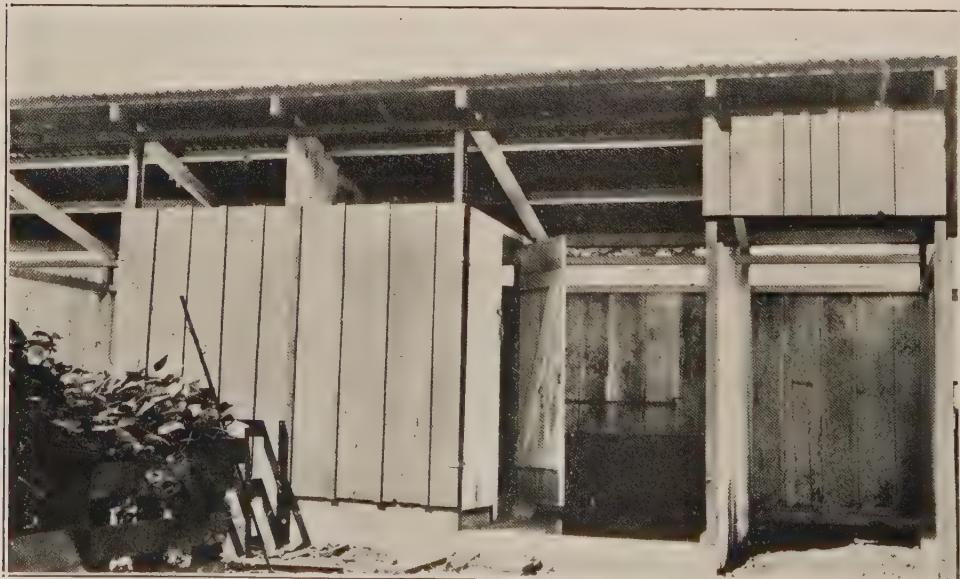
New sanitary outbuilding, floor plans of which are shown in Figs. 9 and 10.
